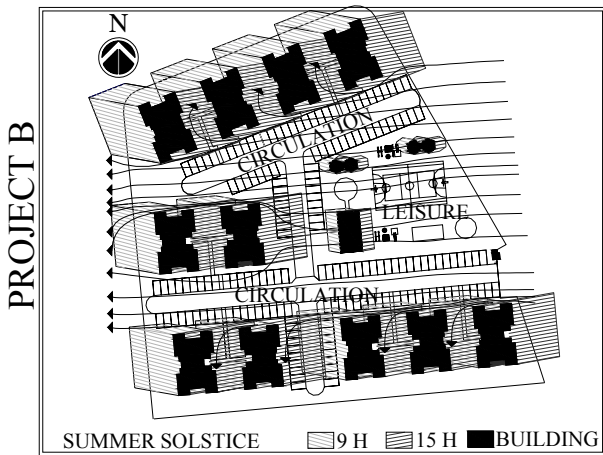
Shading and ventilation in the summer solstice day in house-building B.
